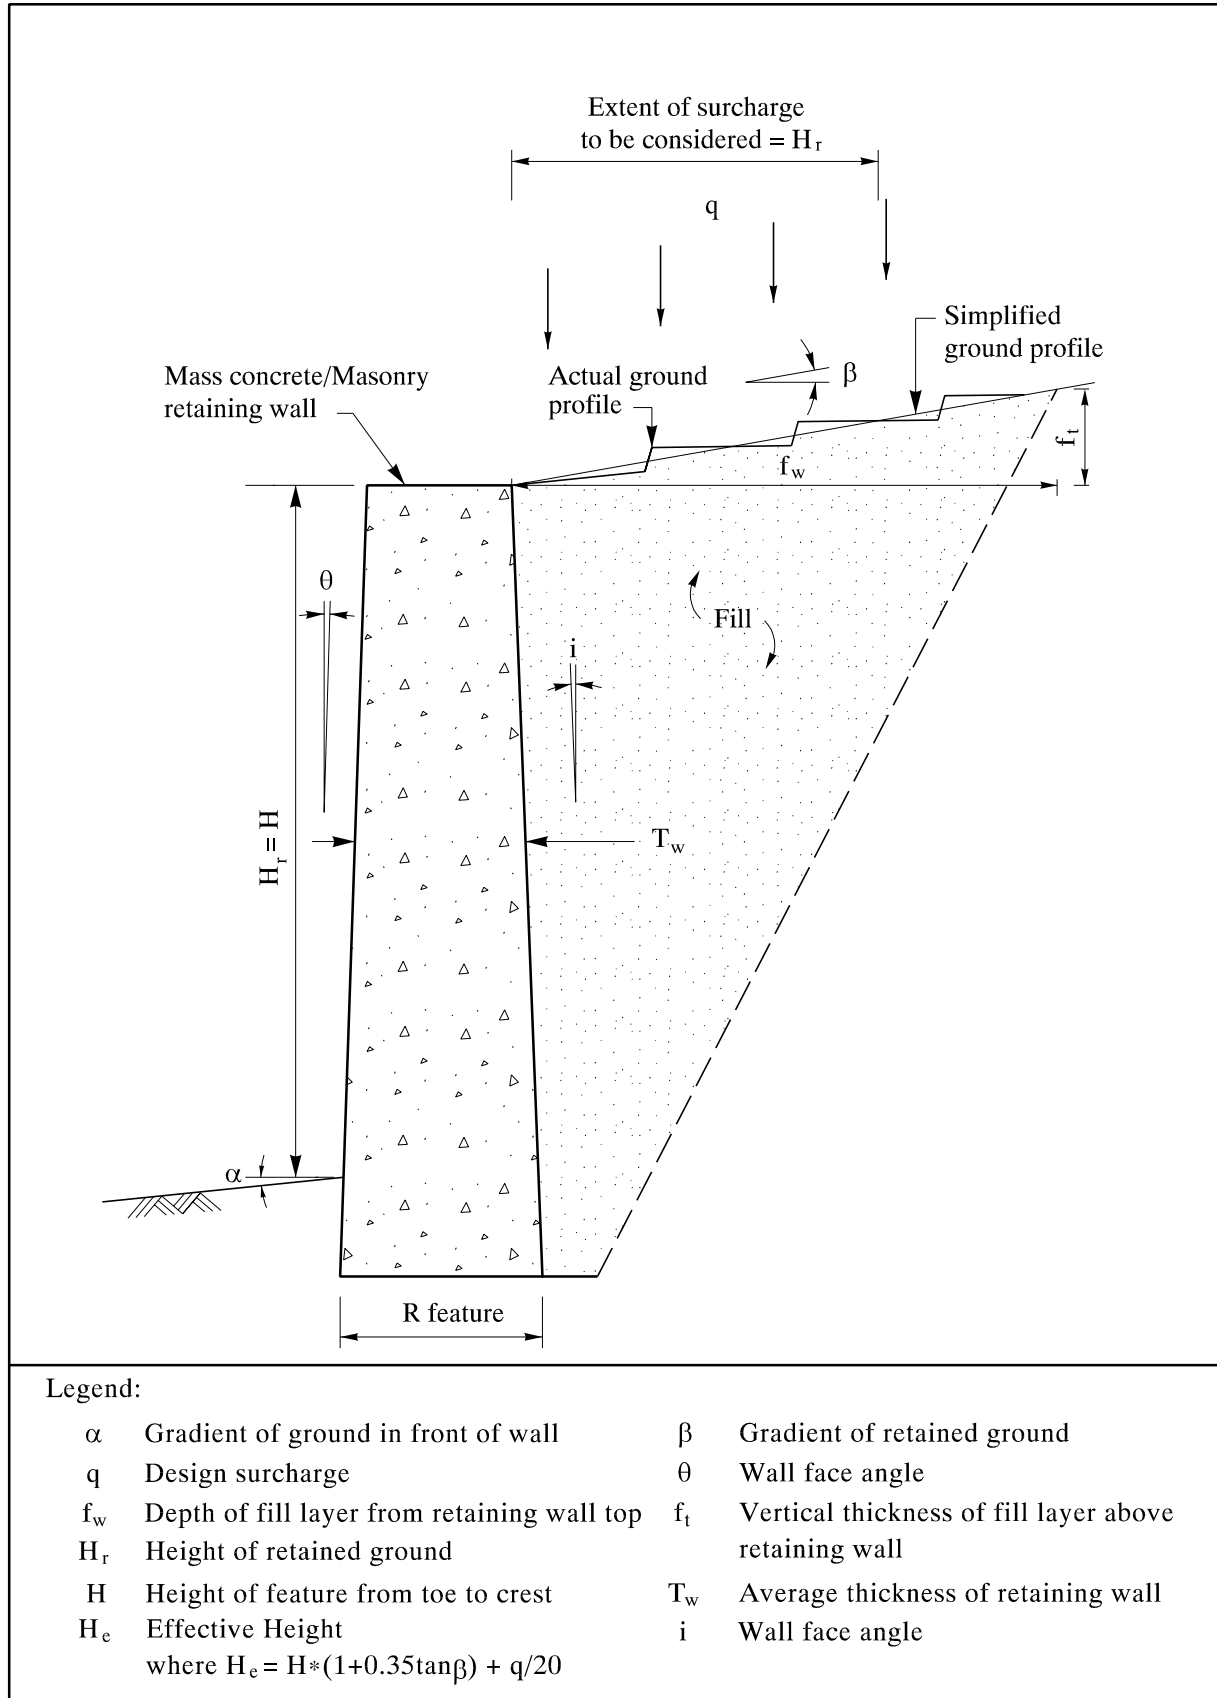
Simplified Geometry of R Feature with a Mass Concrete/Masonry Retaining Wall and the Adjacent Ground
